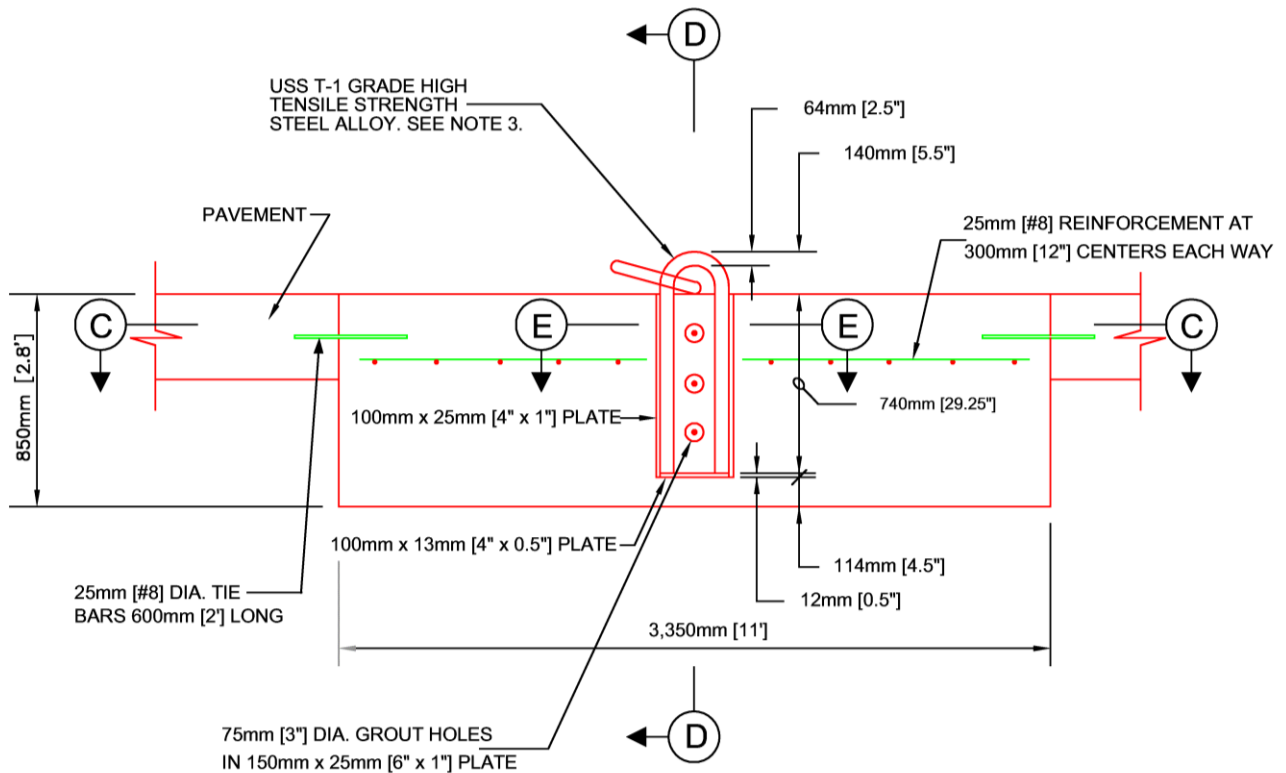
Example of 267 kN (60,000 lb) Square Anchor Block, Cross Section A-A and B-B
